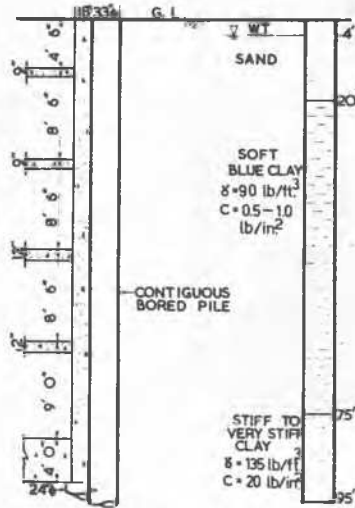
Soil Conditions and Cross Section of Colombo Court Excavation
